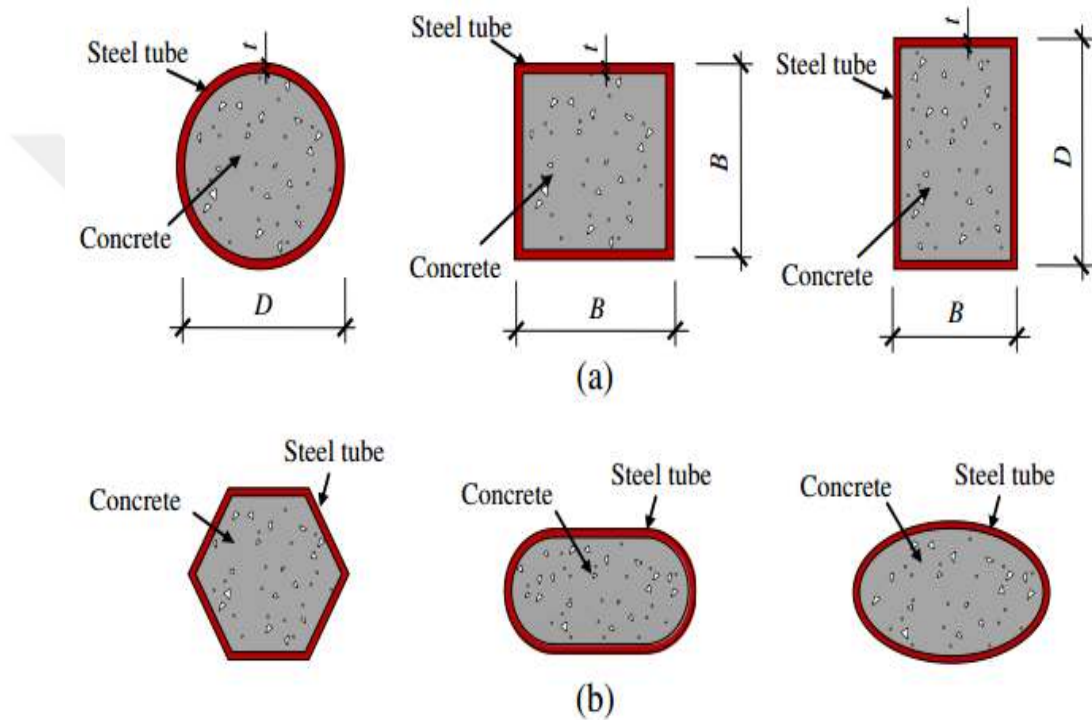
Typical concrete-filled steel tubular cross sections.
